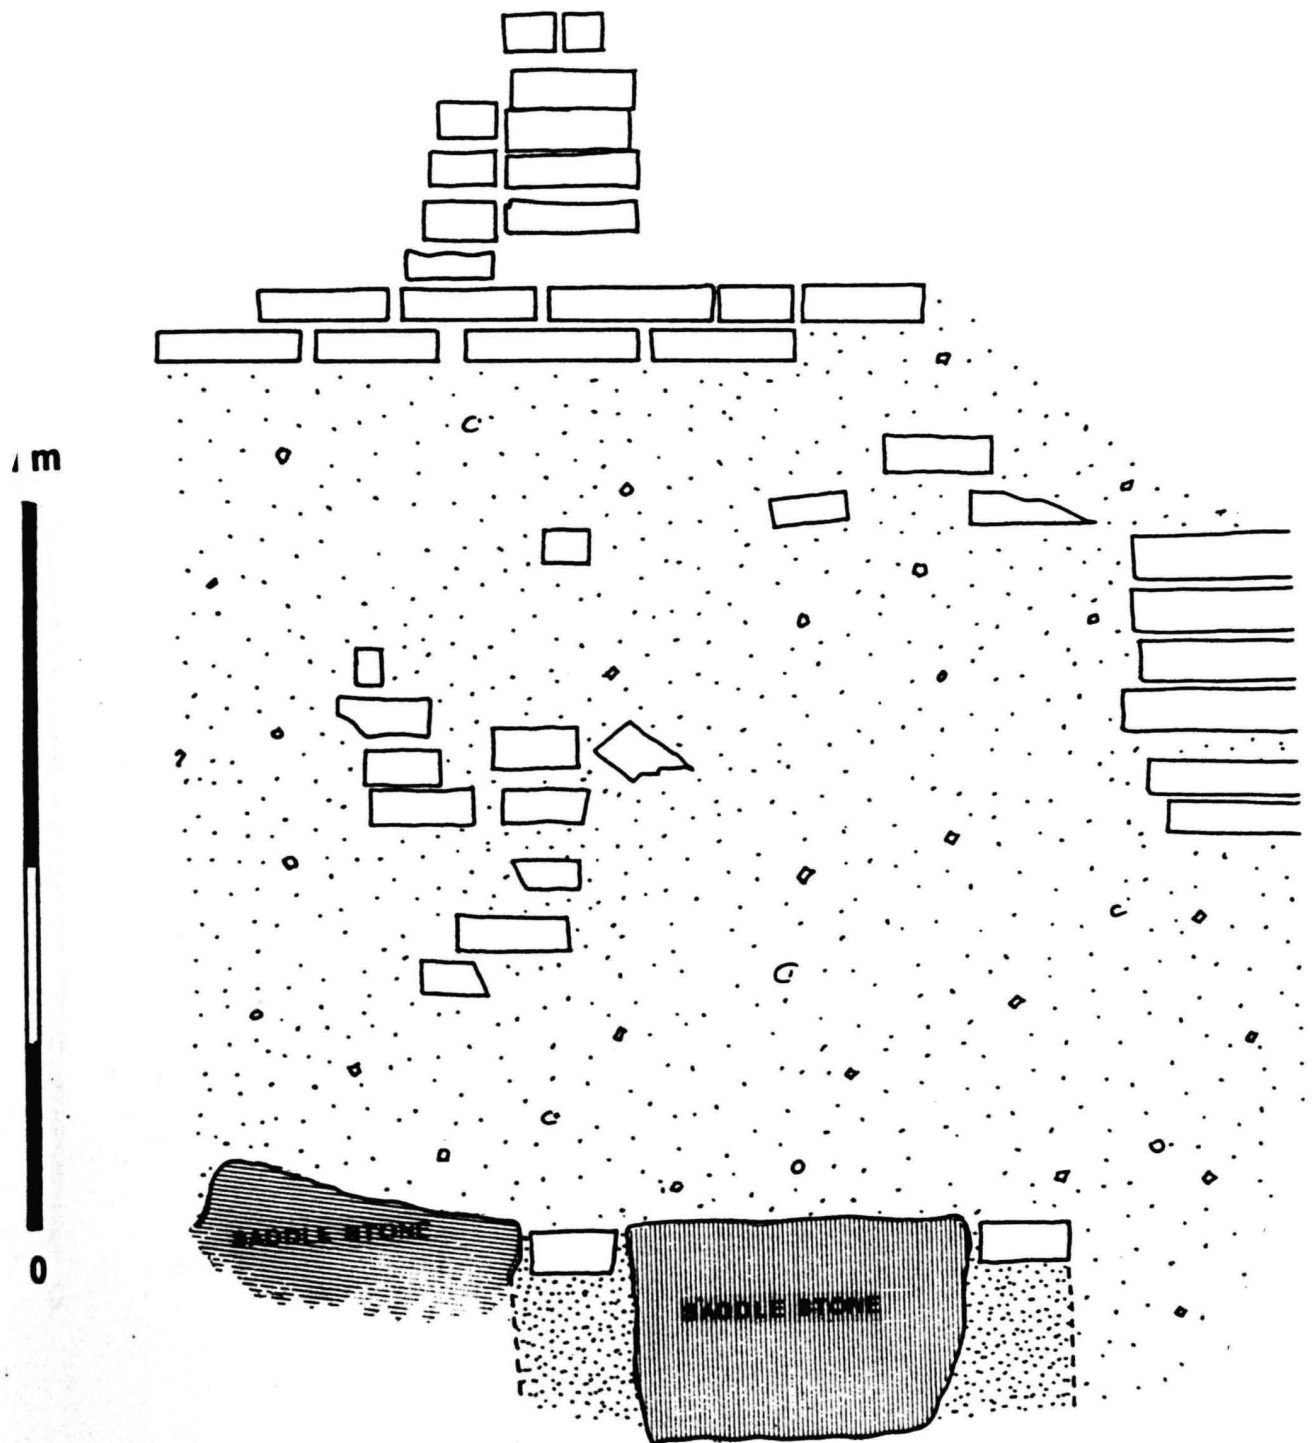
Elevation of pillar foundation 370 (structural phase F)
